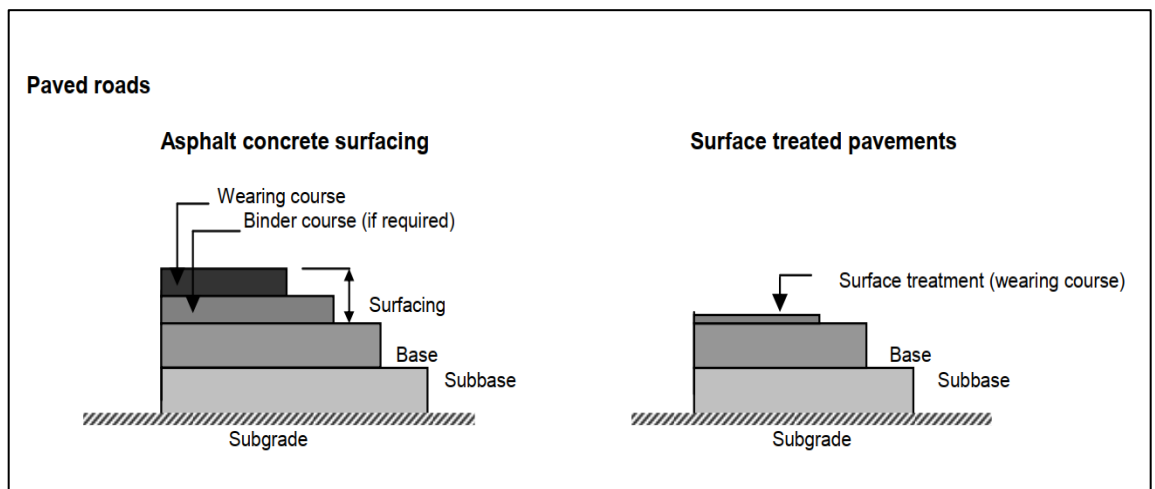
Typical pavement structures in Uganda. Source: Ministry of Works and Transport (MoWT)
